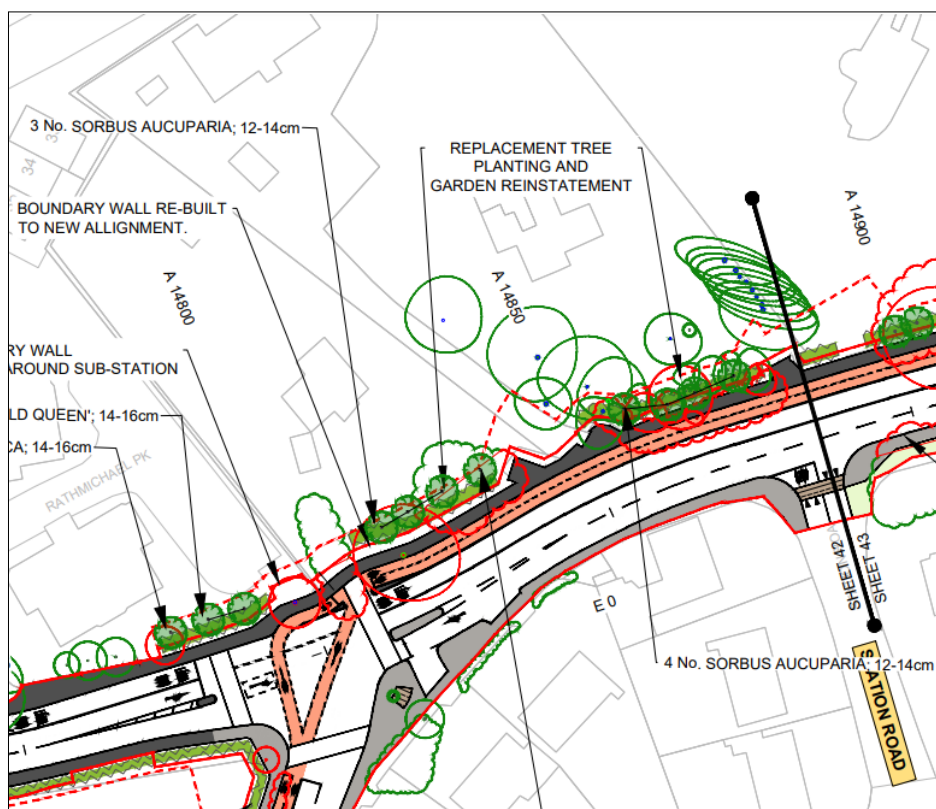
Extract from Landscape Drawings at Narrow Meadow on Dublin Road (Sheet 42)
